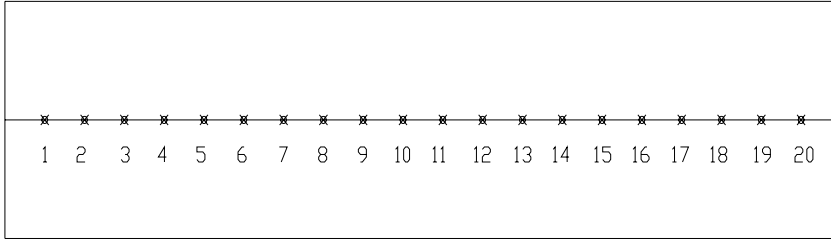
UPV measurement locations on the surface of the concrete beam specimen.
